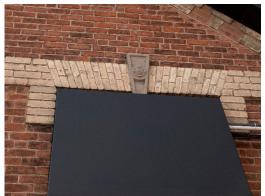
Typical eared jack arch as seen on the south elevation, aligned with the projecting band course and embellished with a cast keystone.
